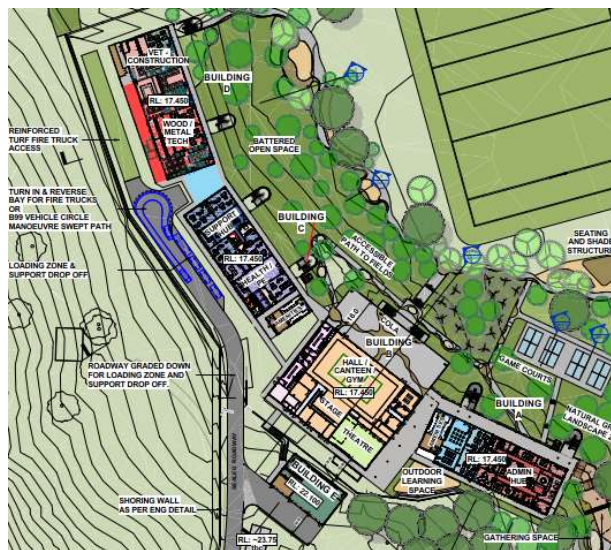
Ground Floor plan indicating C-shaped building and orientation to a predominantly NE direction (Source: EJE Architecture)
